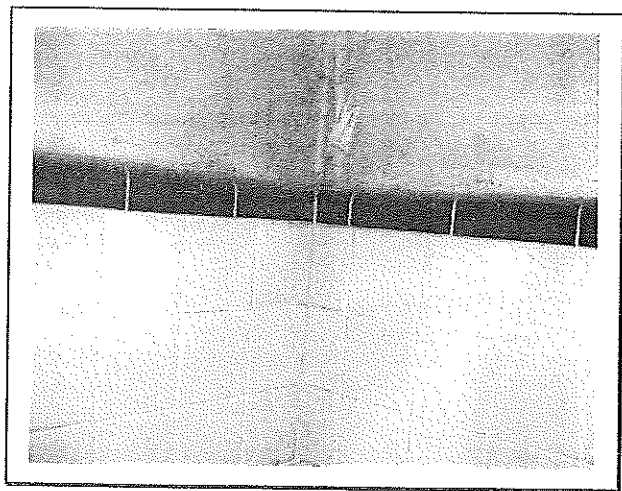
Viewing green 4" wall tile, Basement – SE room.
